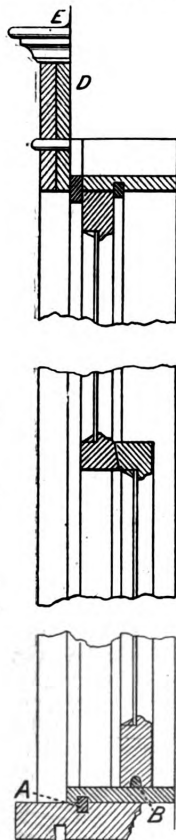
Vertical Section through Frame and Sash.—Scale, $\frac{1}{4}$ inch to the Foot.
